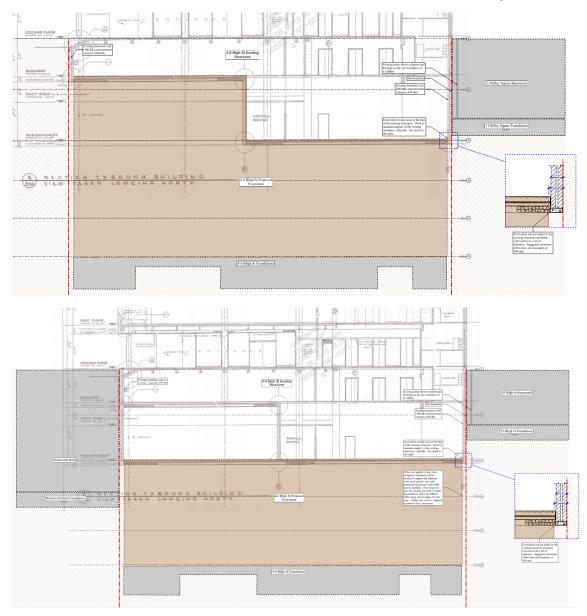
Existing structures/proposed excavations (top – North / bottom – East)
